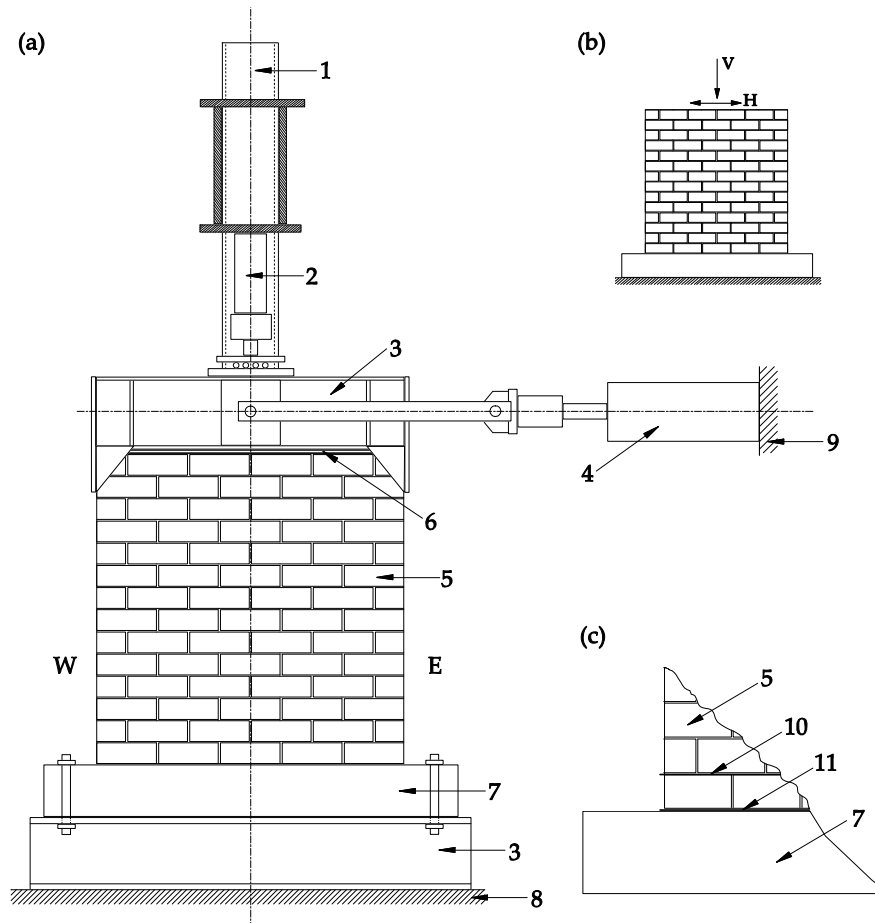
Test set-up; (a) Set-up; (b) Test principle; (c) DPC-detail
